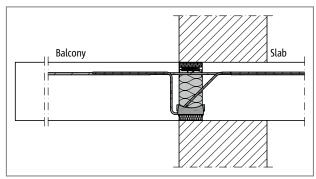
Schöck Isokorb® T type K: Connection with single-leaf masonry
